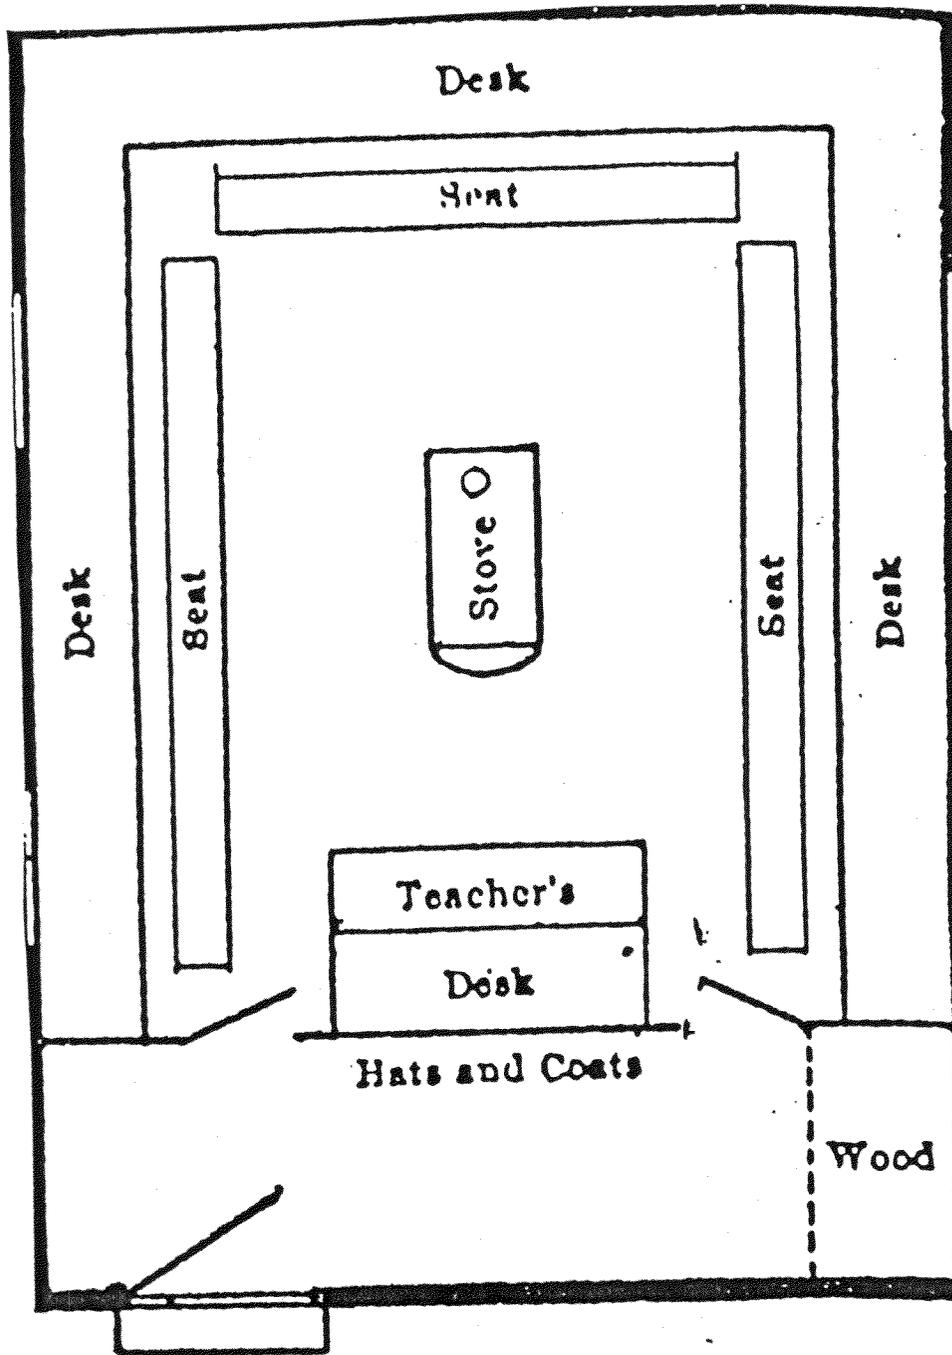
Floor plan by Ellwood P. Cubberly, 1914, showing furniture arrangement reflected in Homer's New England Country School [Rural Life and Education, in Guilliford, p.188.)
